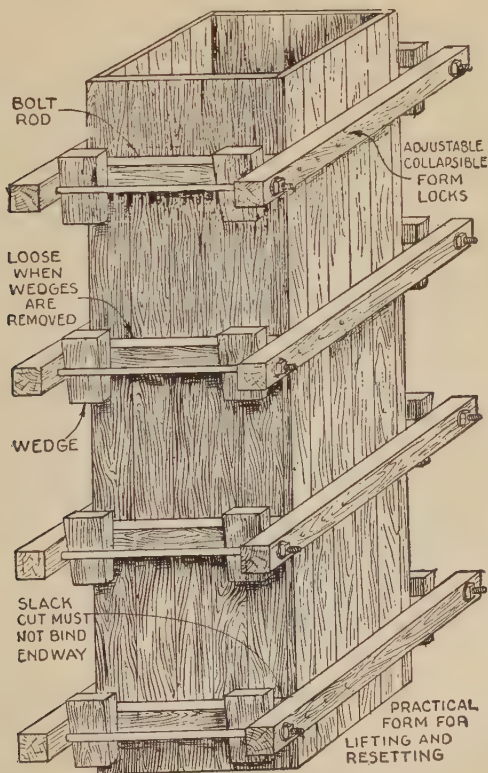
,982.—Sectional form for long rectangular column, having through bolt braces threading through yokes, and wedge adjustment.
